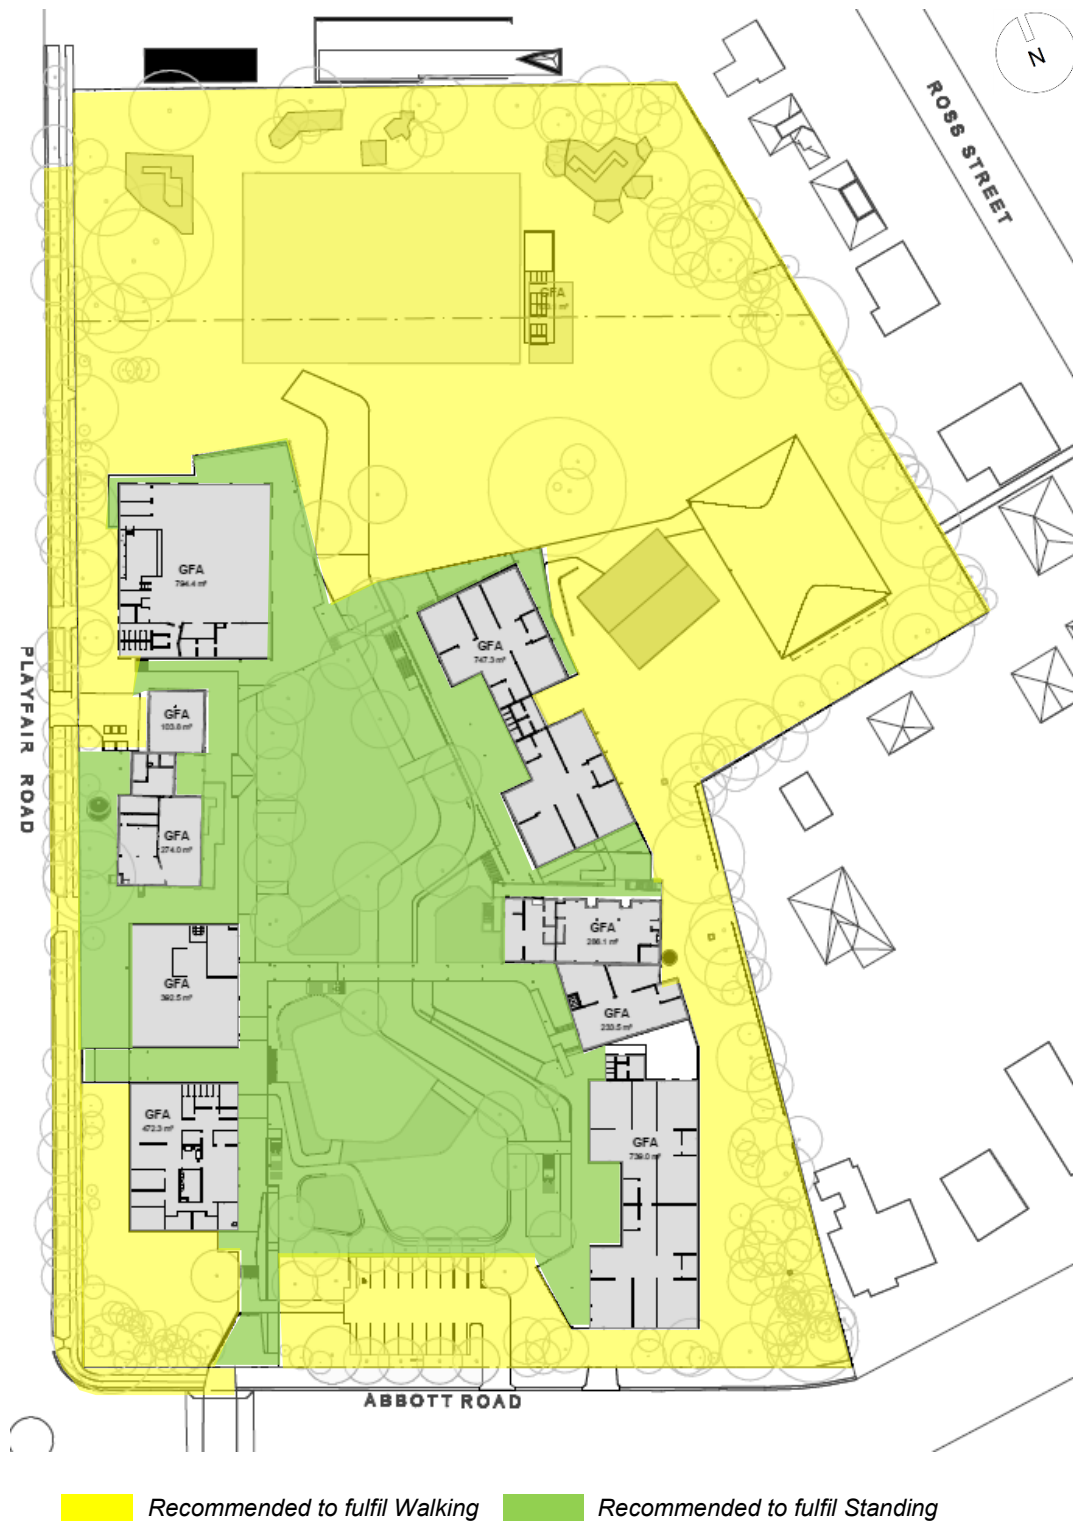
Schematic plan view of the ground floor with recommended wind criteria overlaid
